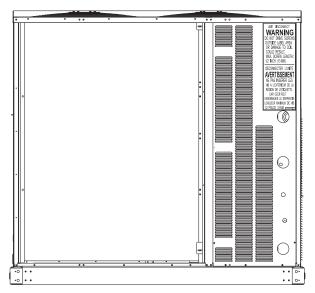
Mounting Position for Field Disconnects (up to 100A)
